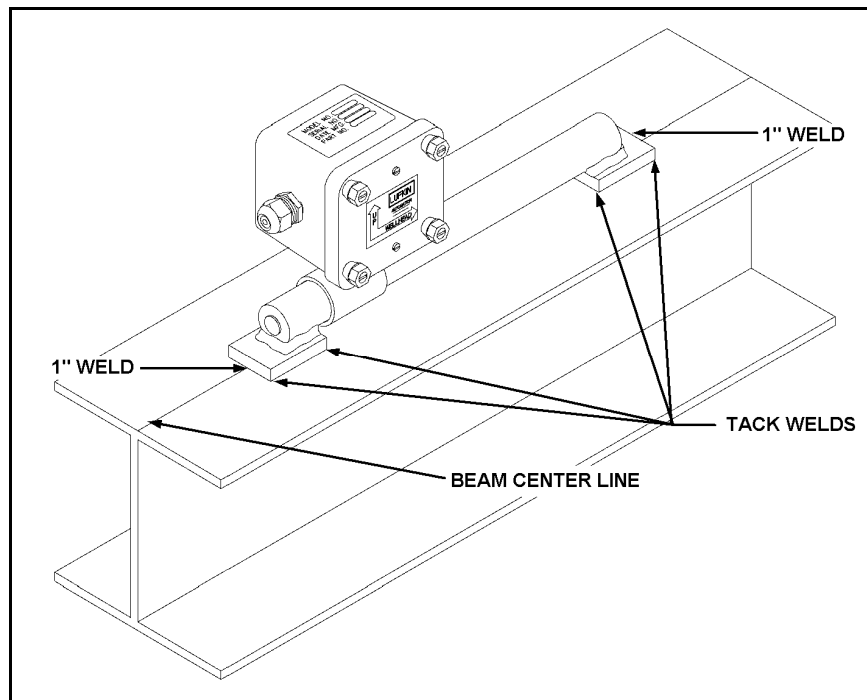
101TL Transducer Welded on the Walking Beam
